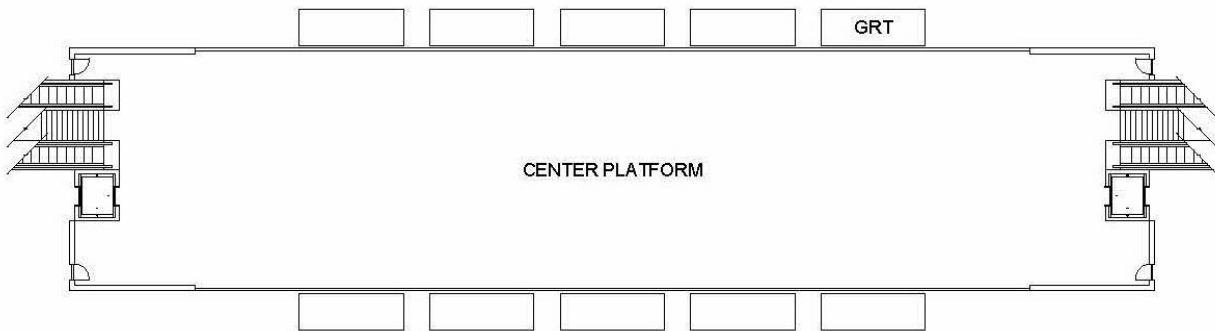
Generic Center Platform Station with Potential GRT Platoon Interface
